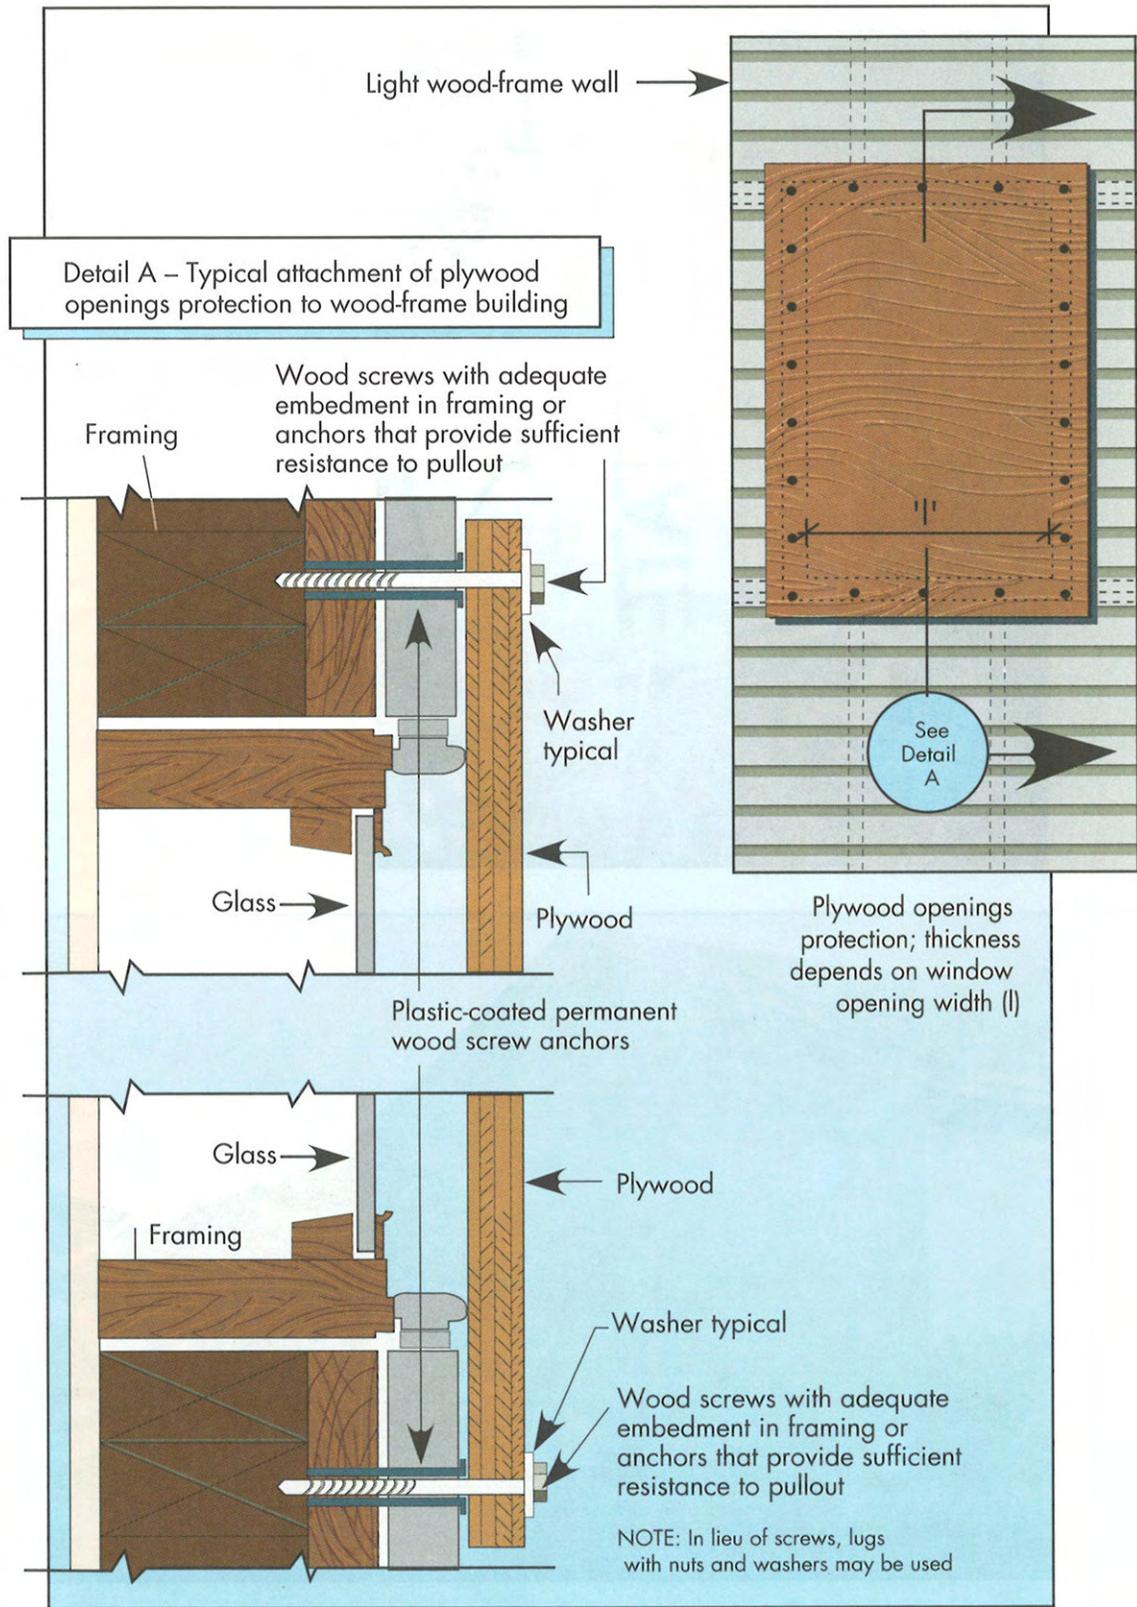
Typical installation of plywood openings protection for wood-frame building.
